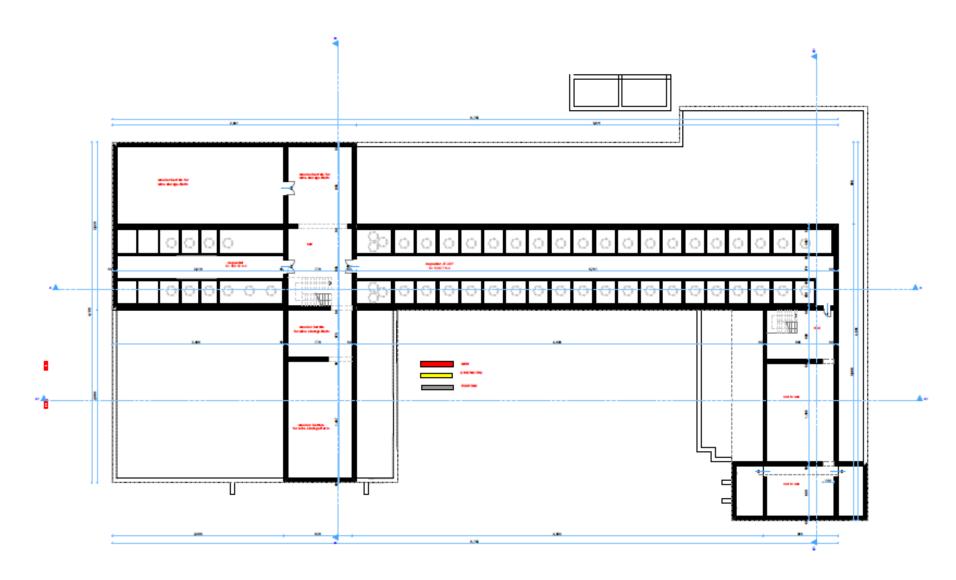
Basement floor - No intervention in structure only in usage of the rooms
